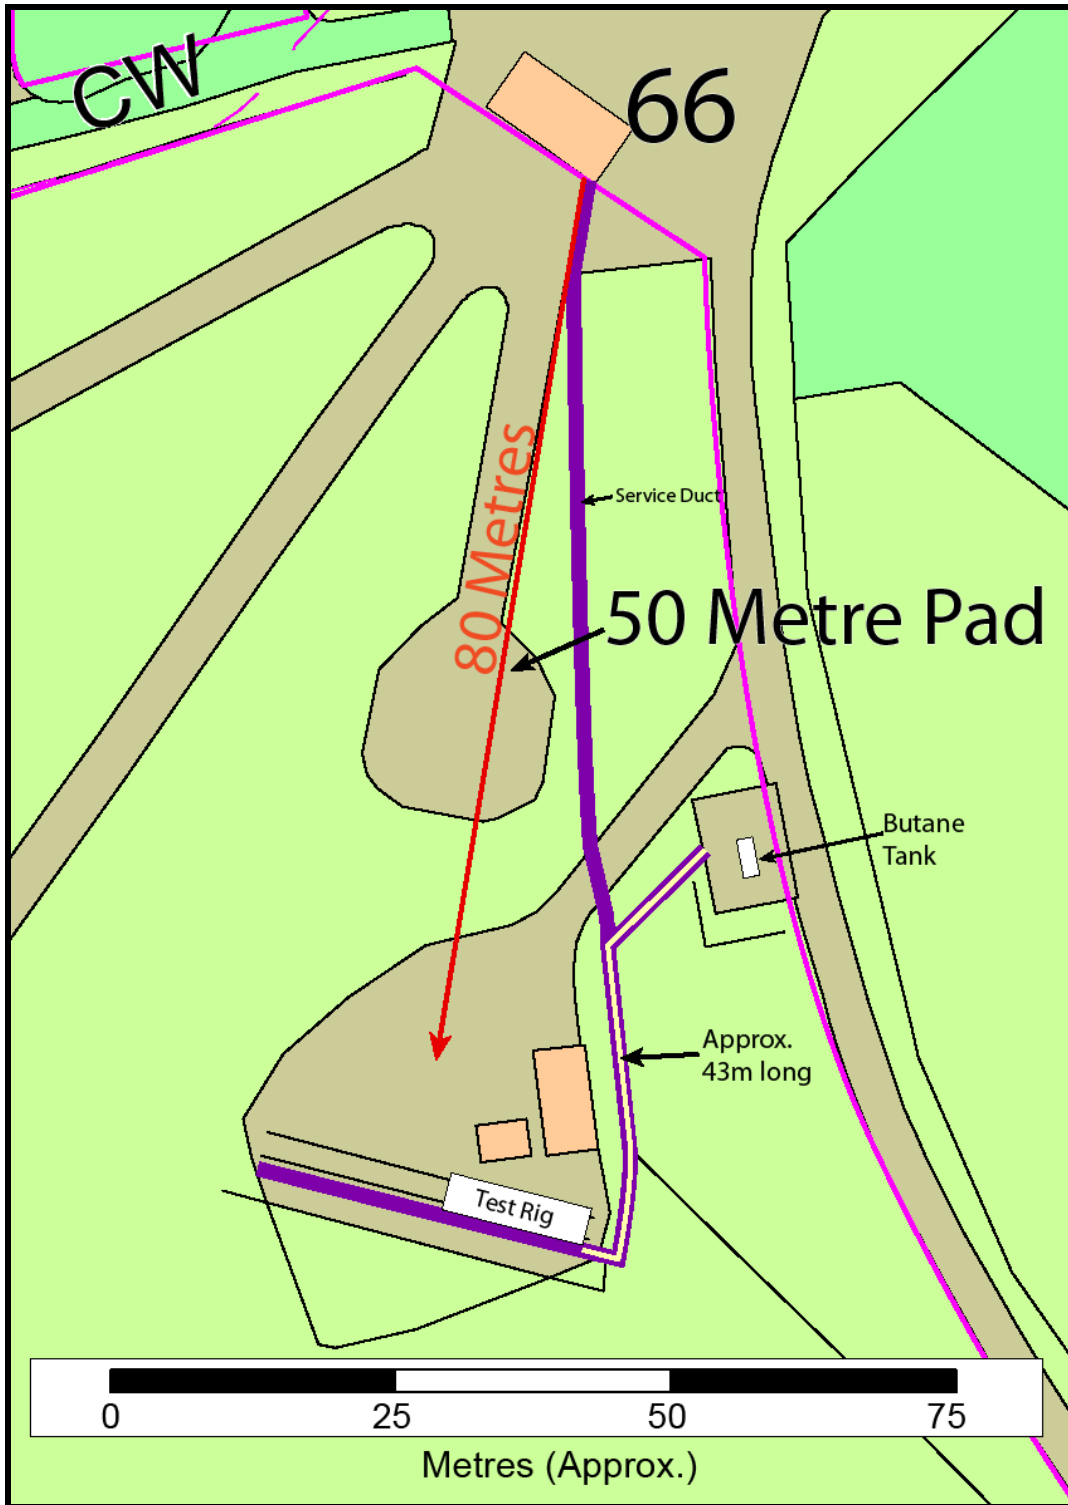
Plan of proposed test rig site showing location of butane tank and service trenches
